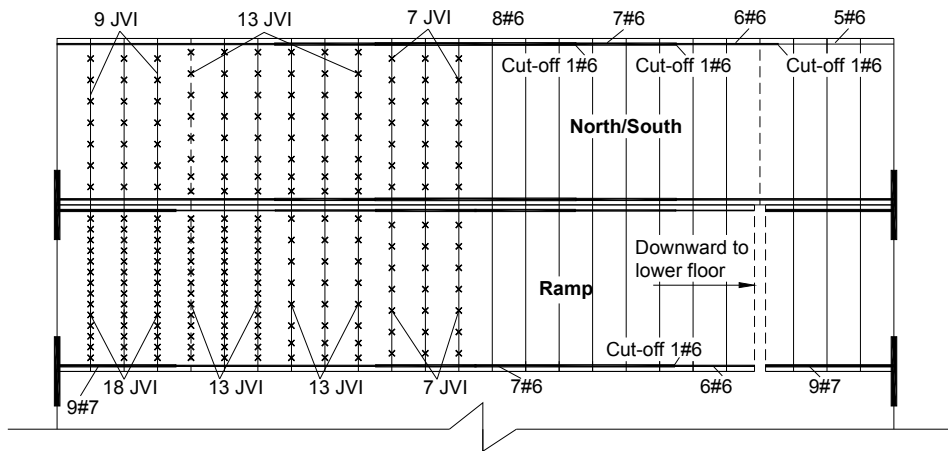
Diaphragm reinforcement at other floors for example 1B.
